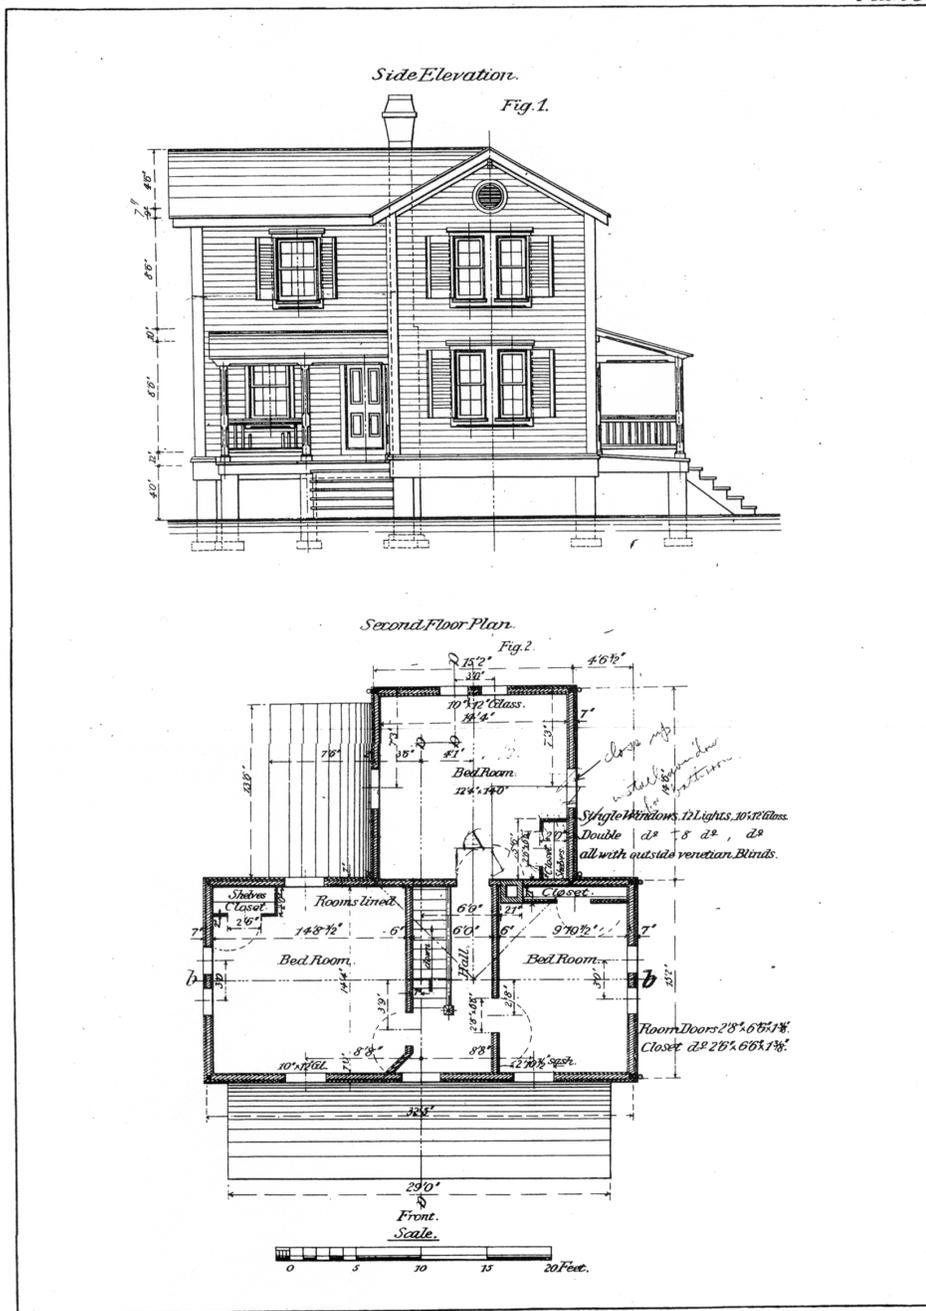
Original side elevation and second floor plan. (U. S. Coast Guard, 1907, with annotations from 1930s)
